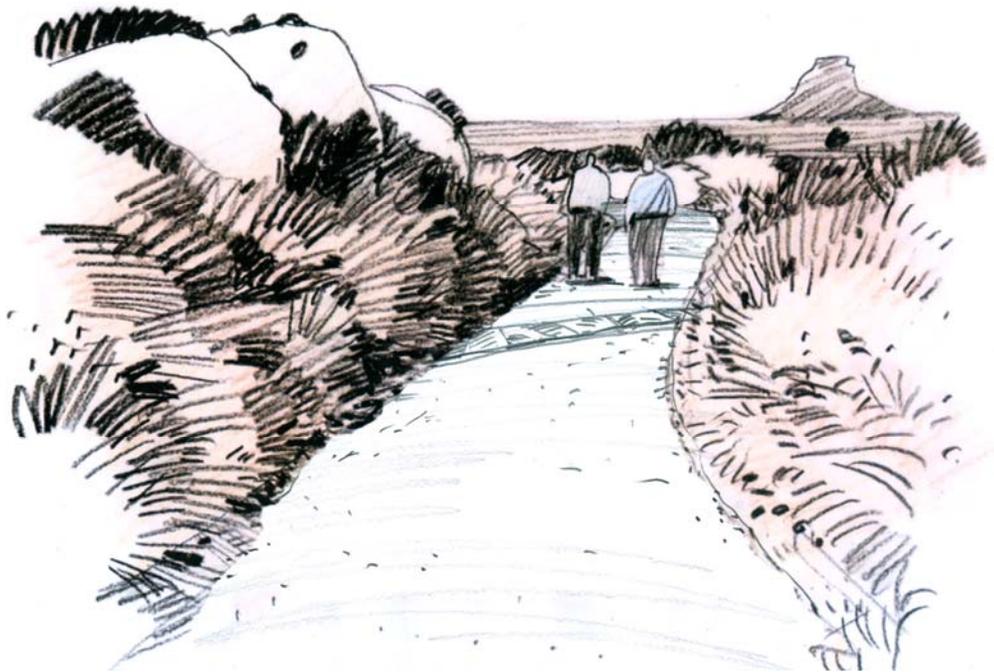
4. Oregon Trail stabilization through raising trail elevation, improved surfacing and water bars, with drainage channels located away from trail. (MBD 2010)
